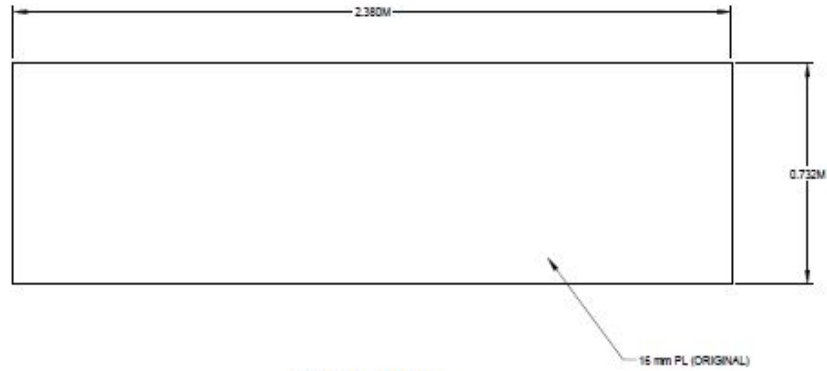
Typical Deck Panel in the Dock's Most Outboard Bay (Adjacent to Inner Wingwall)
